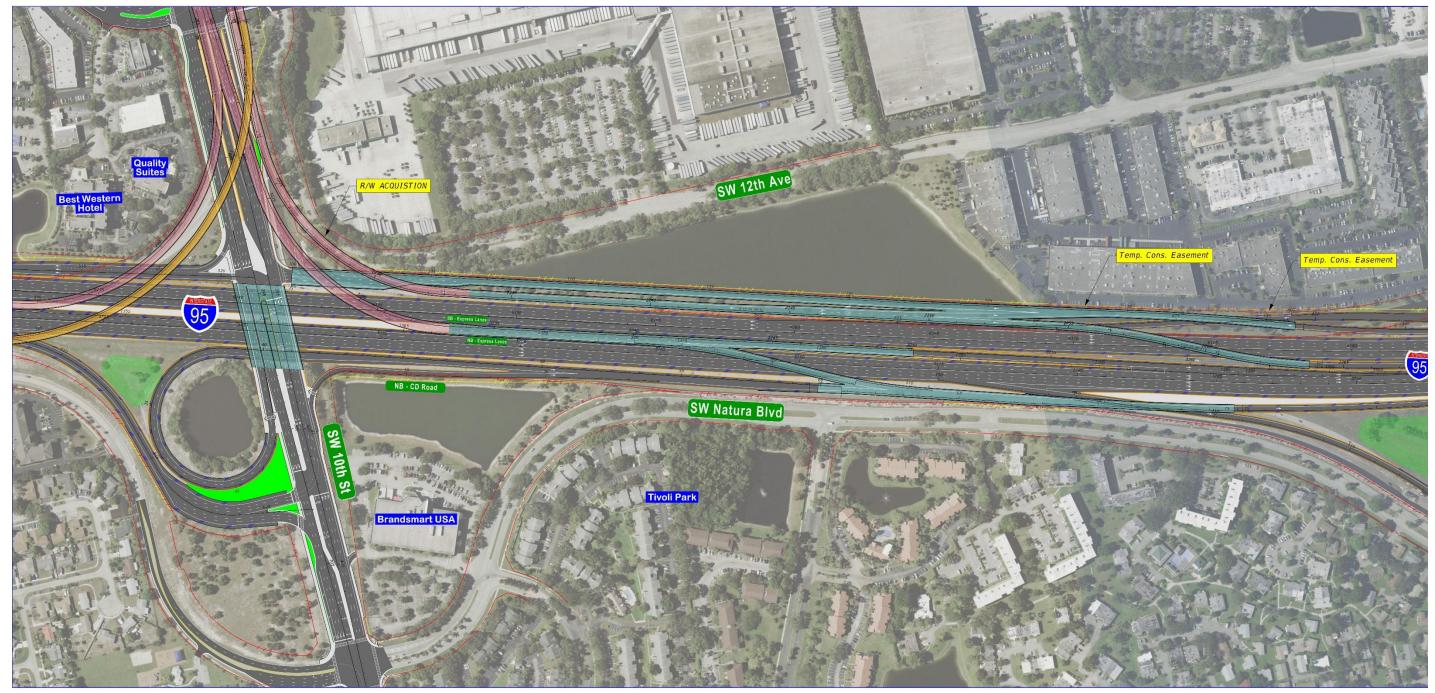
3: Alternative 2 Concept Plan (North of SW 10th Street) (1 of 2)
